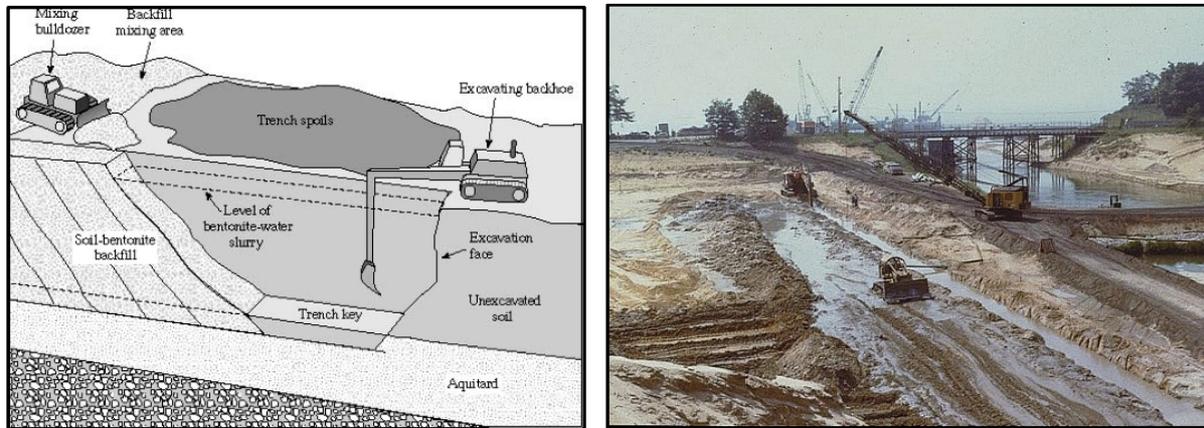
a. Schematic of the excavation and backfill of a SB cutoff wall (LaGrega et al. 1994). b. Photo of the excavation of a SB cutoff wall using both backhoe and clam shell, backfill mixing is with a tracked bulldozer
